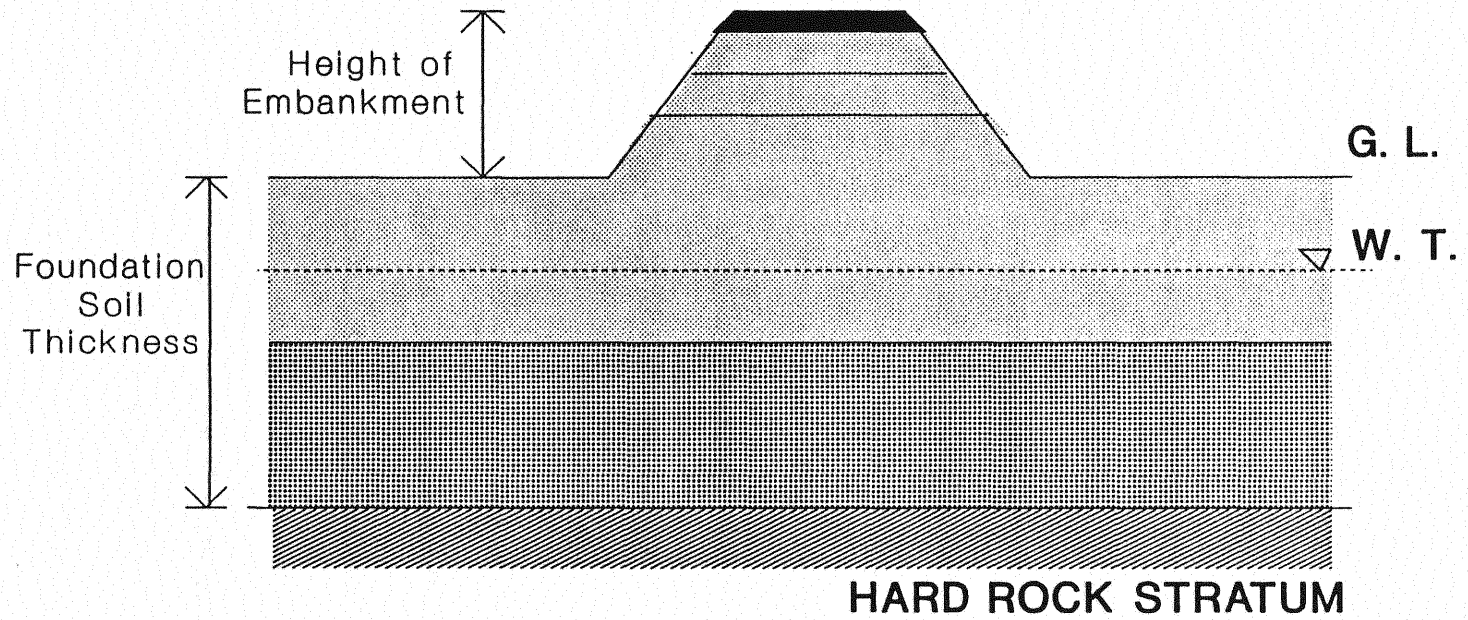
Cross-section of the embankment and the underlying foundation soil near the bridge approach.
